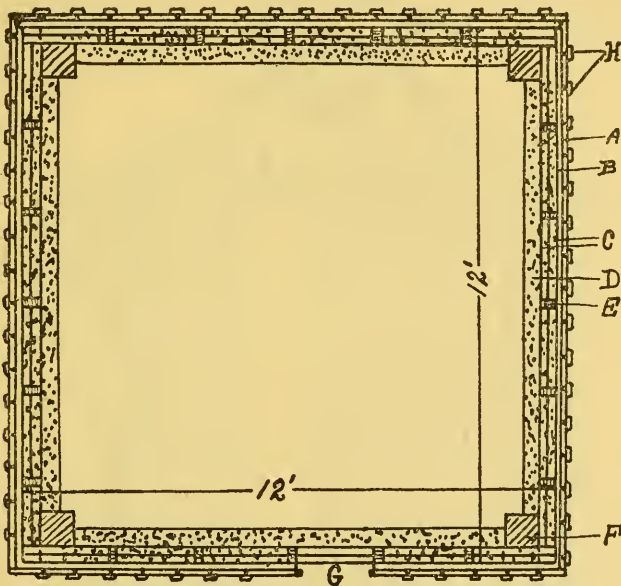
Well-built farm ice house plan. A, siding placed vertically; B, inside layer of boards placed horizontally; C, sills and plates made of two 2 by 4's spiked together; D, sawdust; E, 2 by 4 studs on 24 inch centers; F, posts about 7 by 7, 3 feet in ground and 11 feet above ground; G, opening for ice full height of house, and closed by boards placed in groove, constructed as shown in drawing; H, battens.
